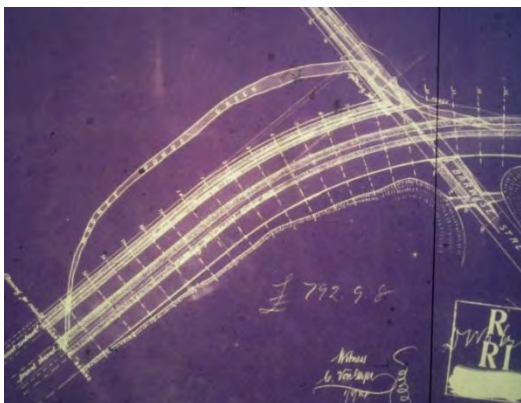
Plan Moonee Ponds Channel Extension 1884 showing natural course of creek and new paved channels south of Racecourse Road. (VPRO)
